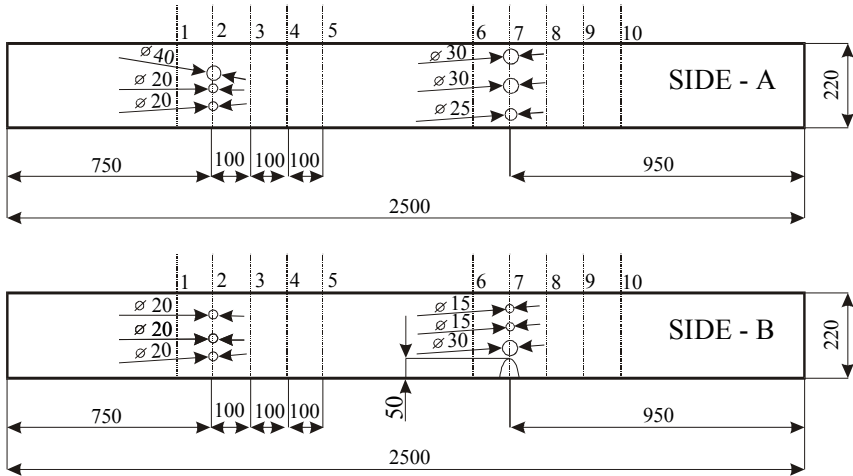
The data sheet for specimen - board No. 3. Method of the knots identification on the board faces (sides A, B) and the testing point arrangement in the board length.
